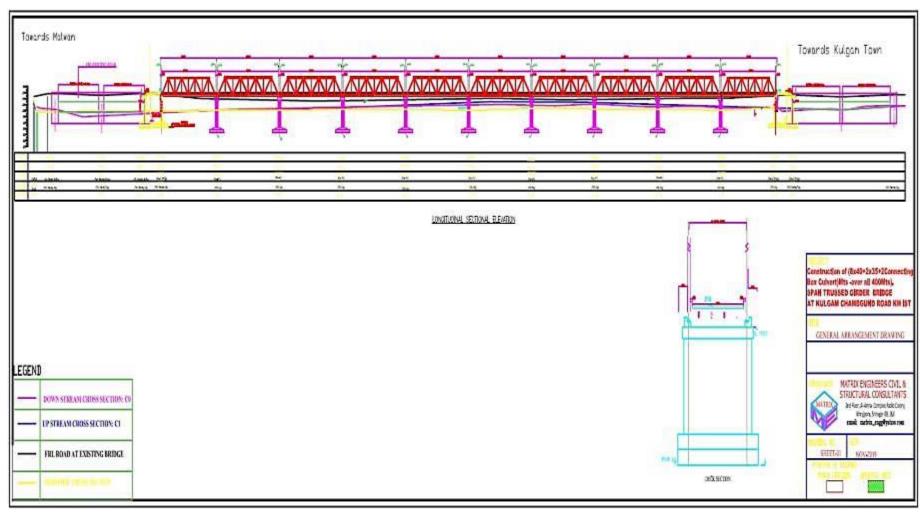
General Arrangement Drawing (GAD) of the Proposed Construction 400 meter Span Truss Girder Bridge over Vishav Nallah at Kulgam-Chambgund Road in District Kulgam
